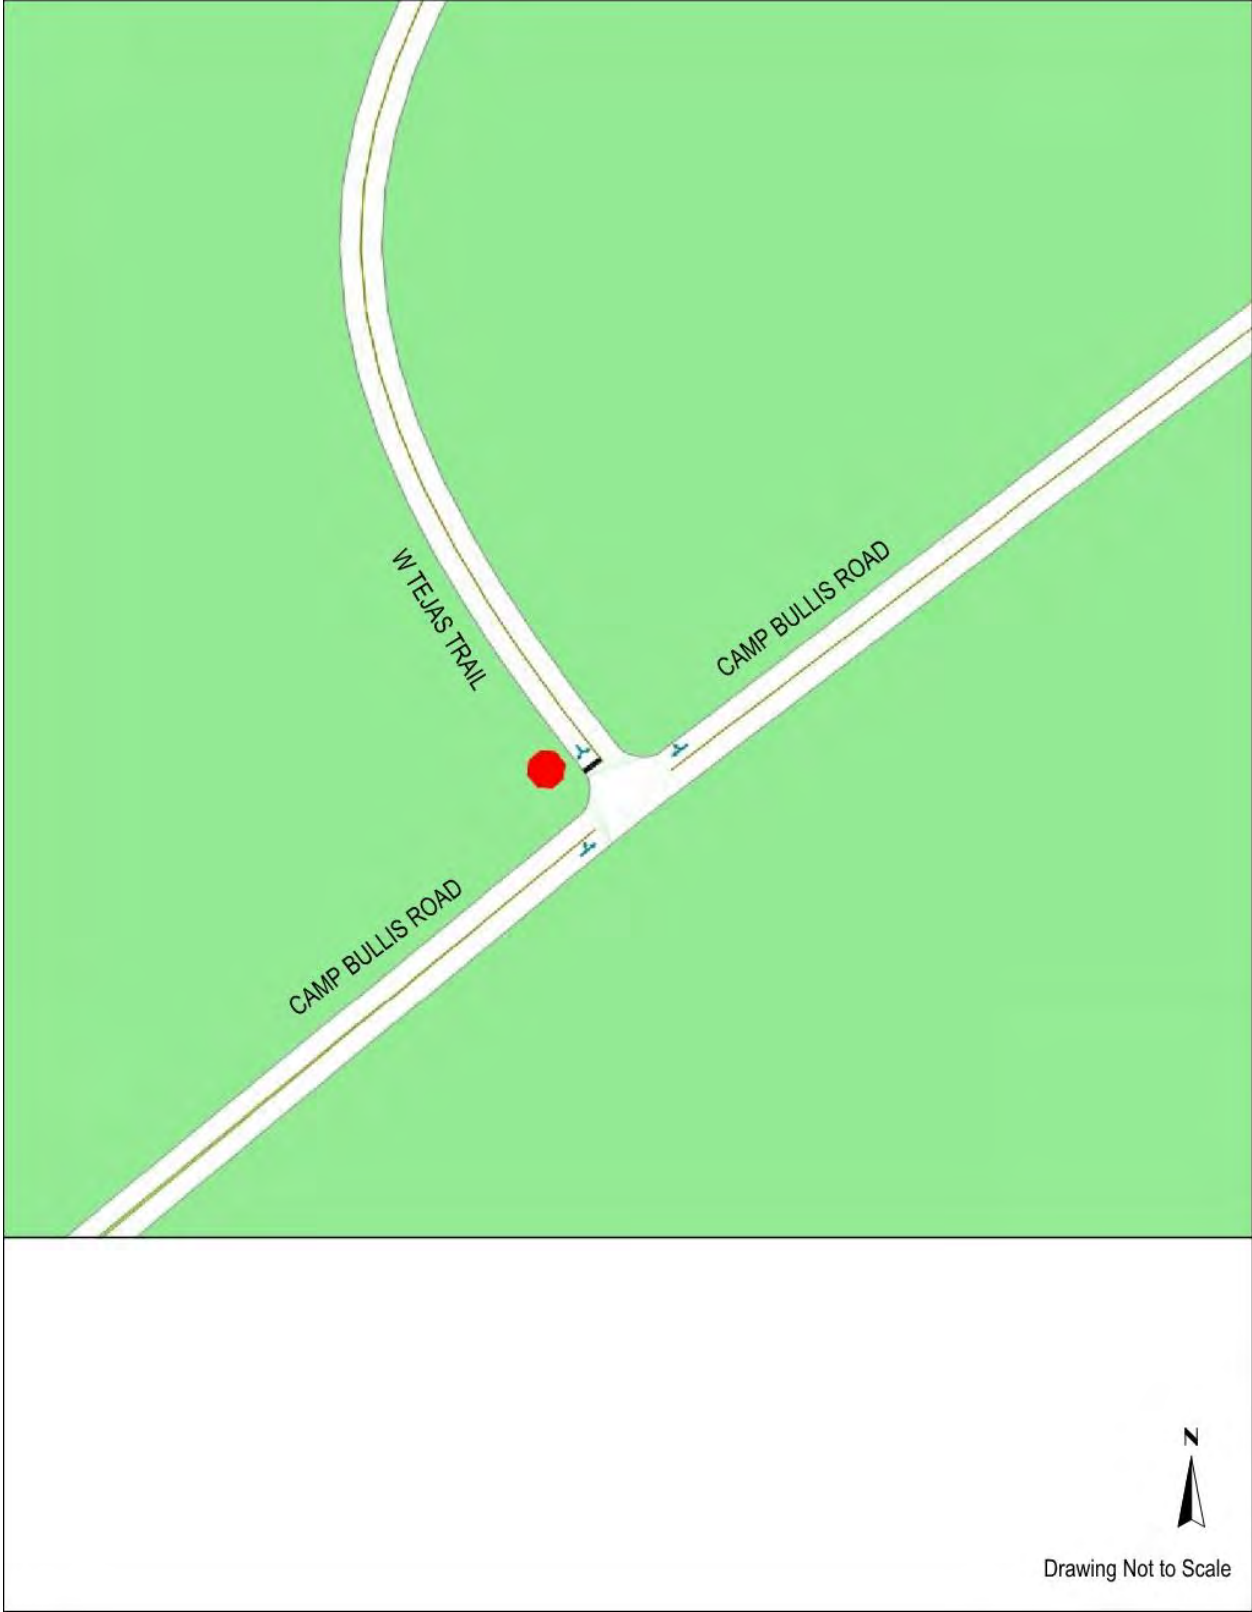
Camp Bullis Road and W Tejas Trail Existing Geometric Conditions
